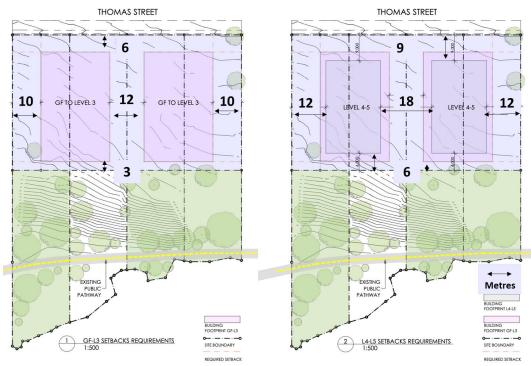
Plan view of setback and separation controls in Area 5, Morton Street DCP
